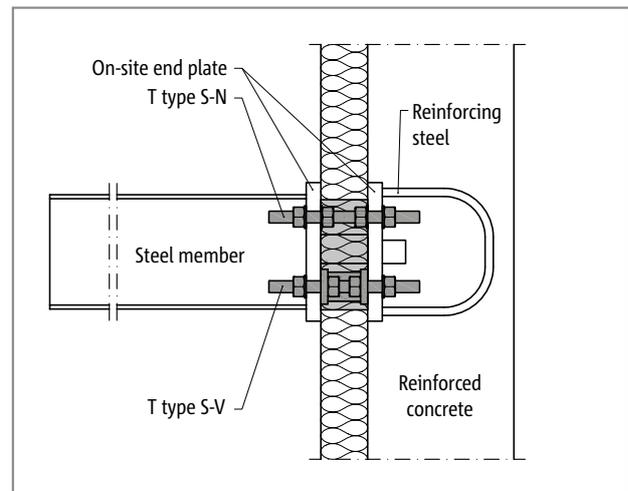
Schöck Isokorb® T type S-N and T type S-V: for connection of steel structures to reinforced concrete
